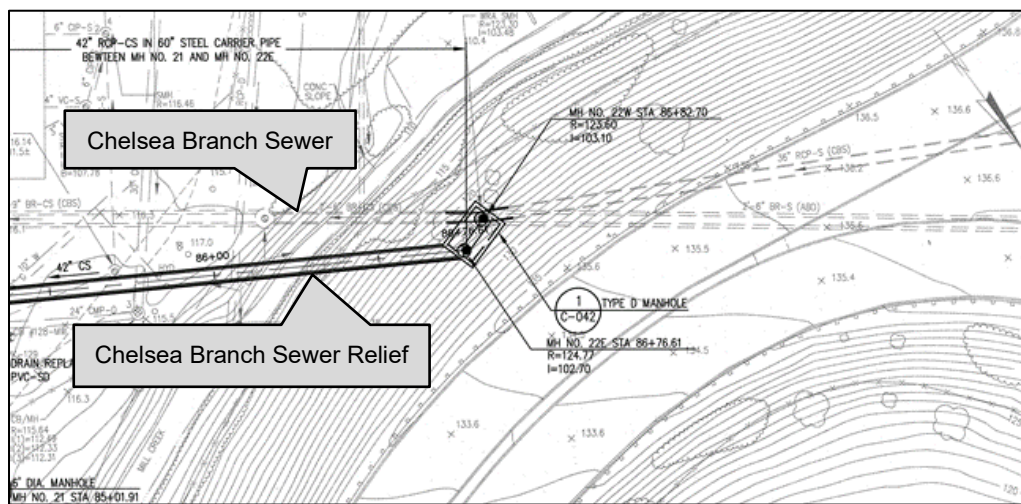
Manhole 22 on the Chelsea Branch Sewer (from MWRA Chelsea Branch Sewer Relief Project Drawing No. C-027 Record Drawing)
